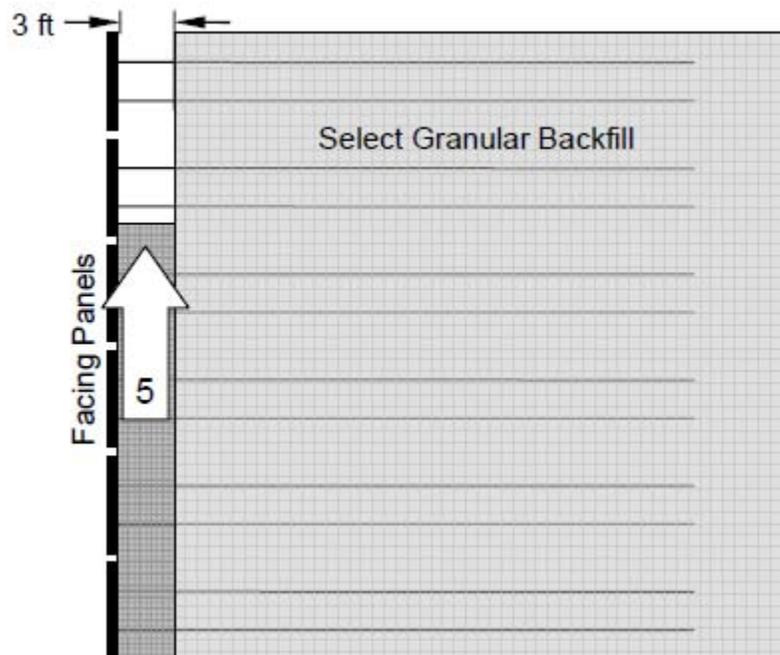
SGB Placement and Compaction Next to Facing Panels (Plan View)
